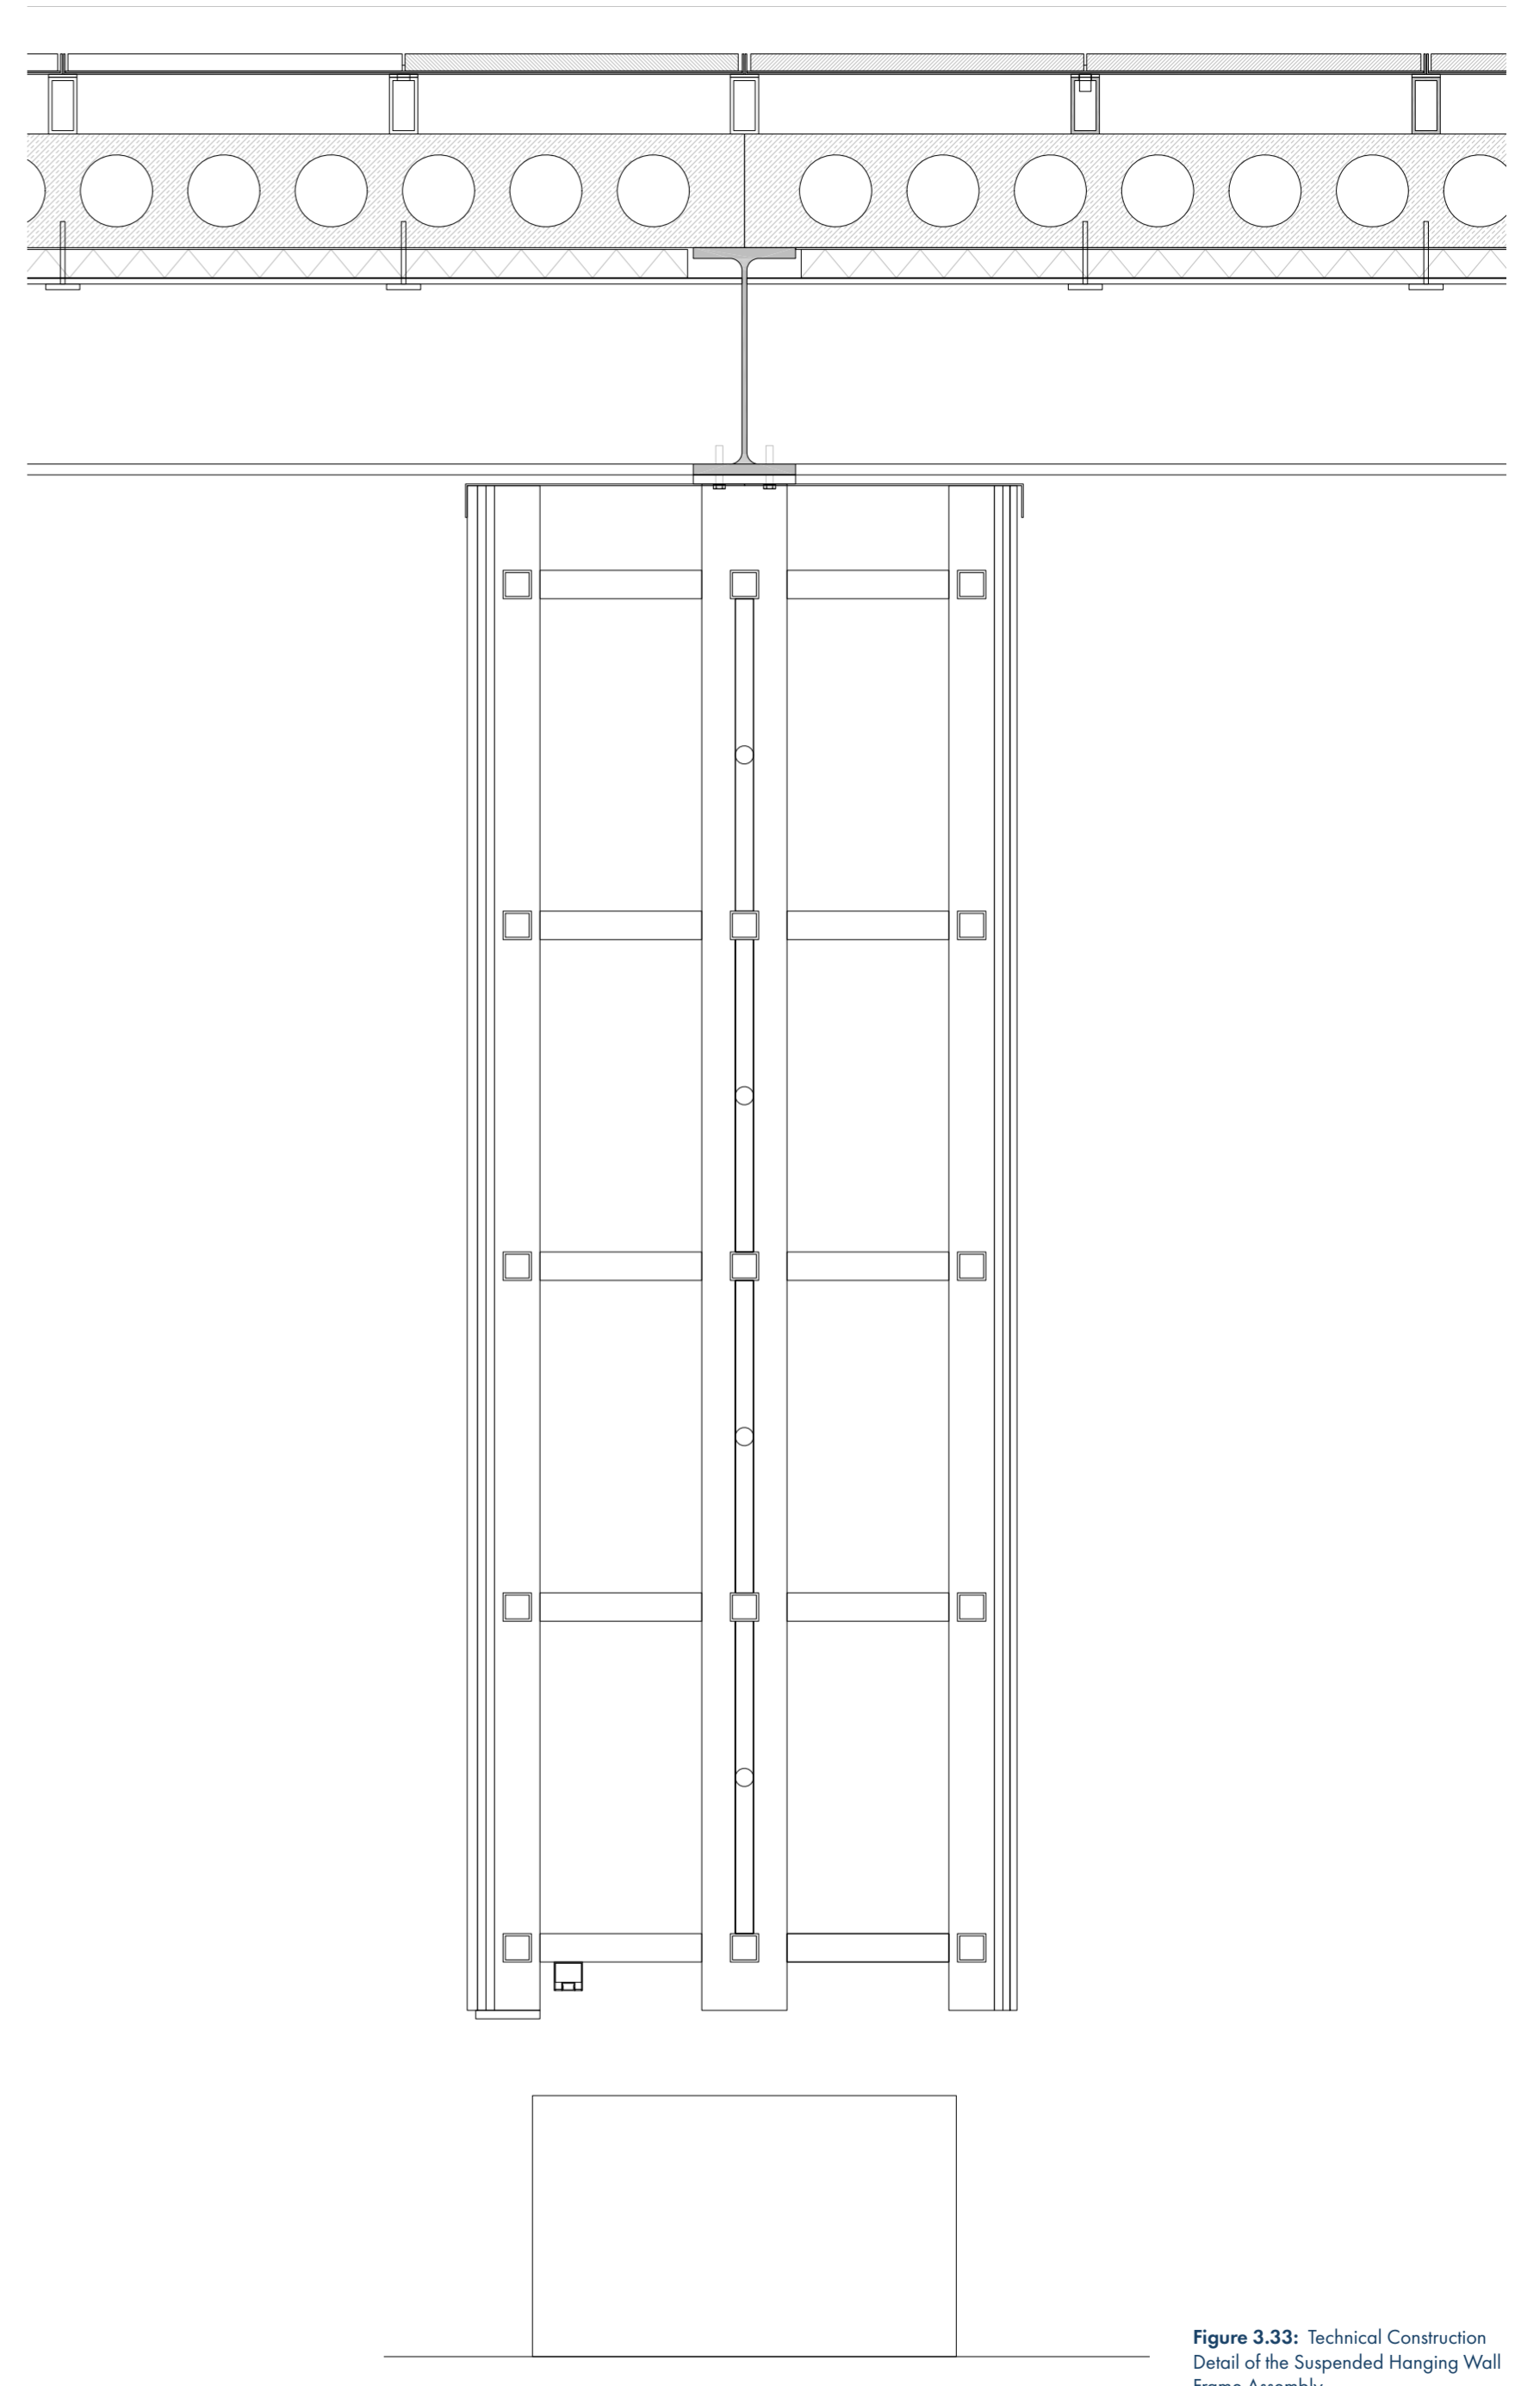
Technical Construction Detail of the Suspended Hanging Wall Frame Assembly
